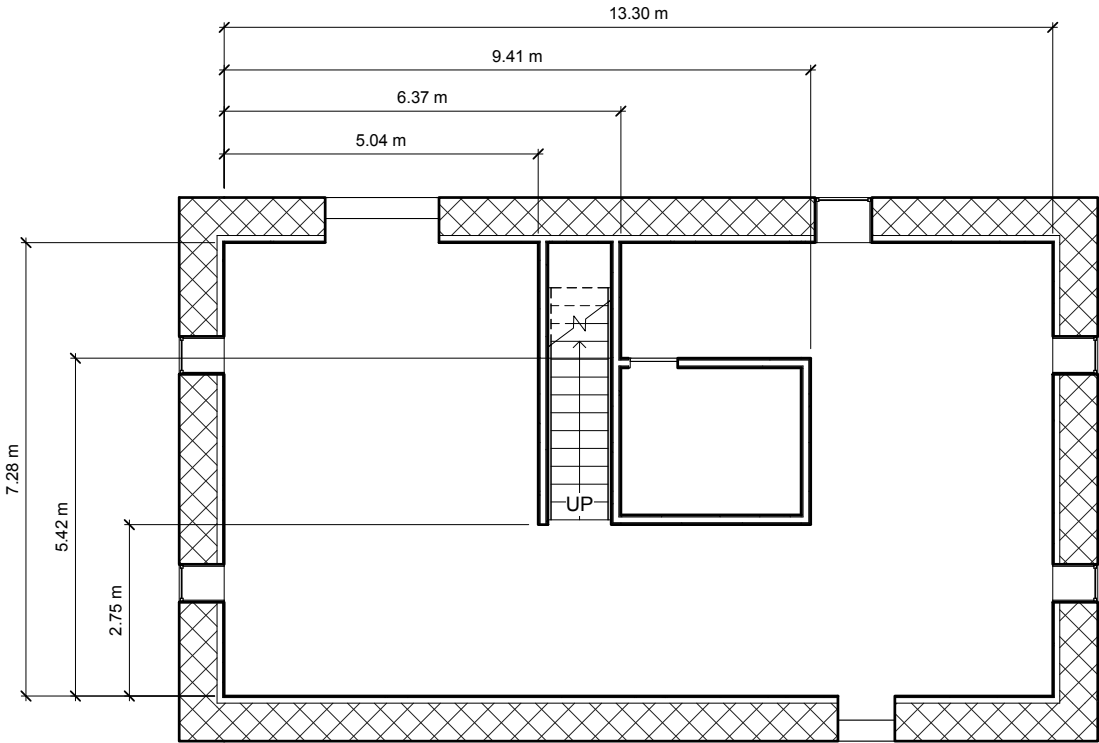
Fully Dimensioned Floor Plan of the Basement
